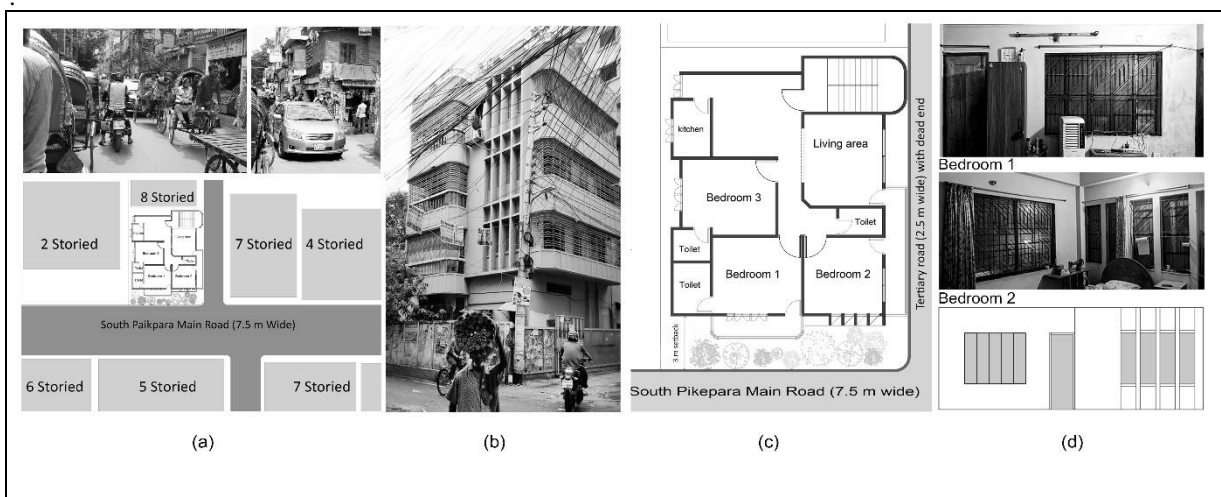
(a) Site surroundings, (b) studied building, (c) typical floor plan and (d) partial elevation of roadside façade
